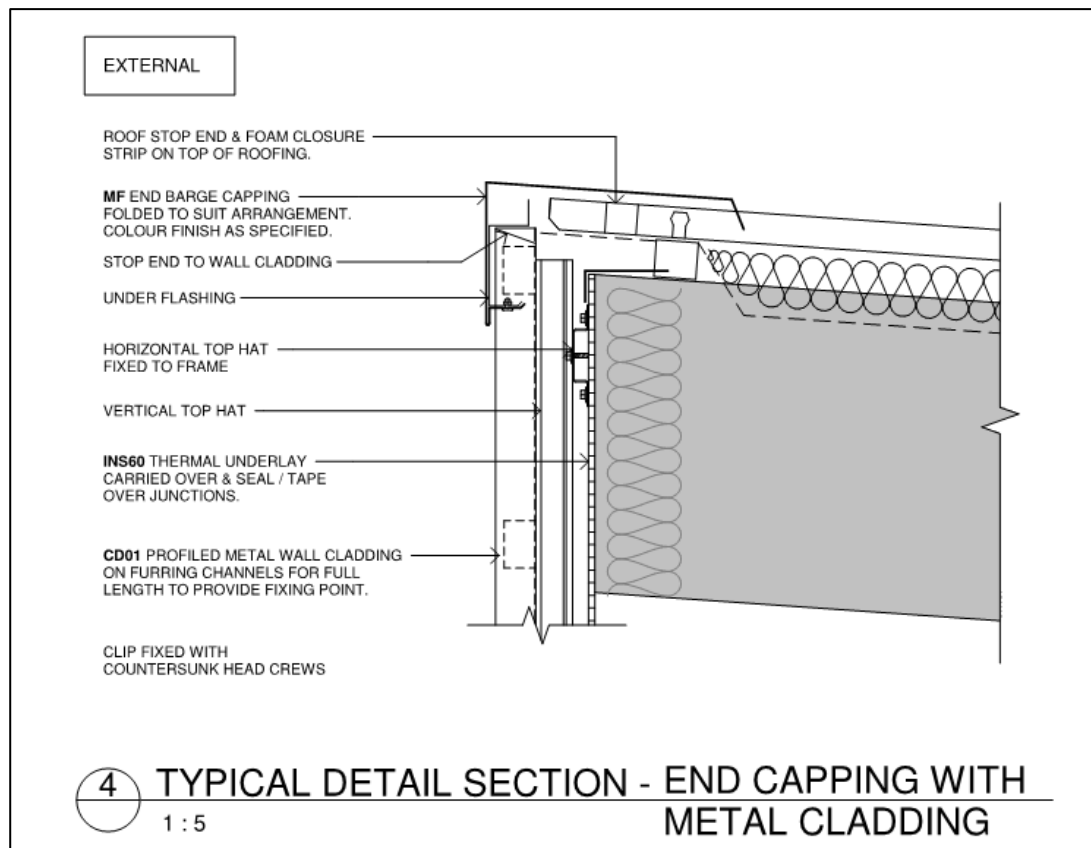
Typical end capping detail : Source – Plan M-AR-DW-5103 Typical Details – Sheet 3
